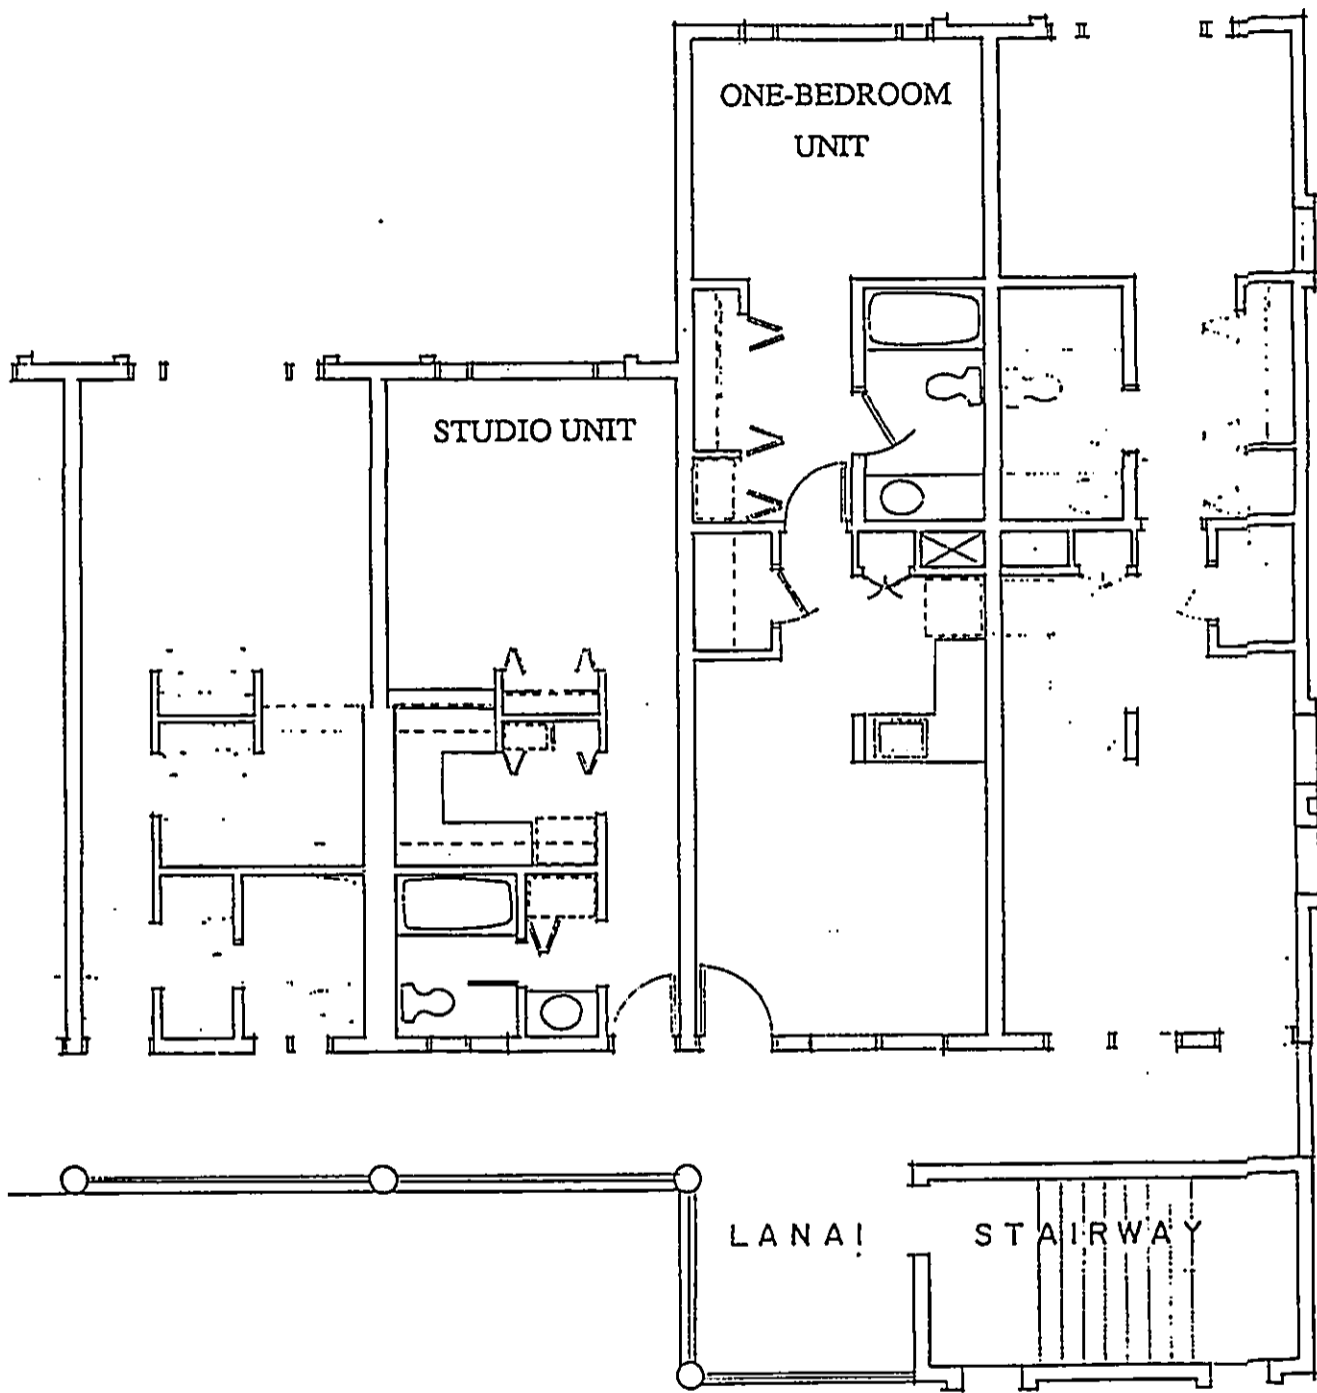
Floor Plan of Individual Studio and One-Bedroom Elderly Units
